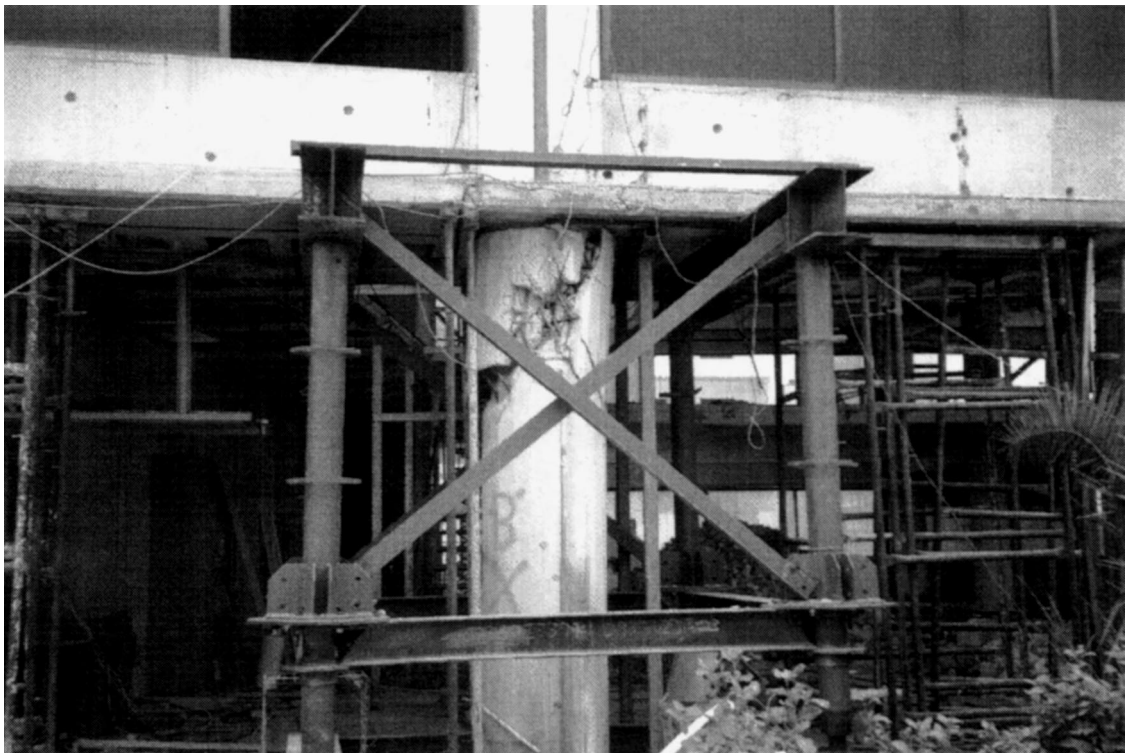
Reinforced concrete column of a multi-story building that failed in the area of Menidi.
